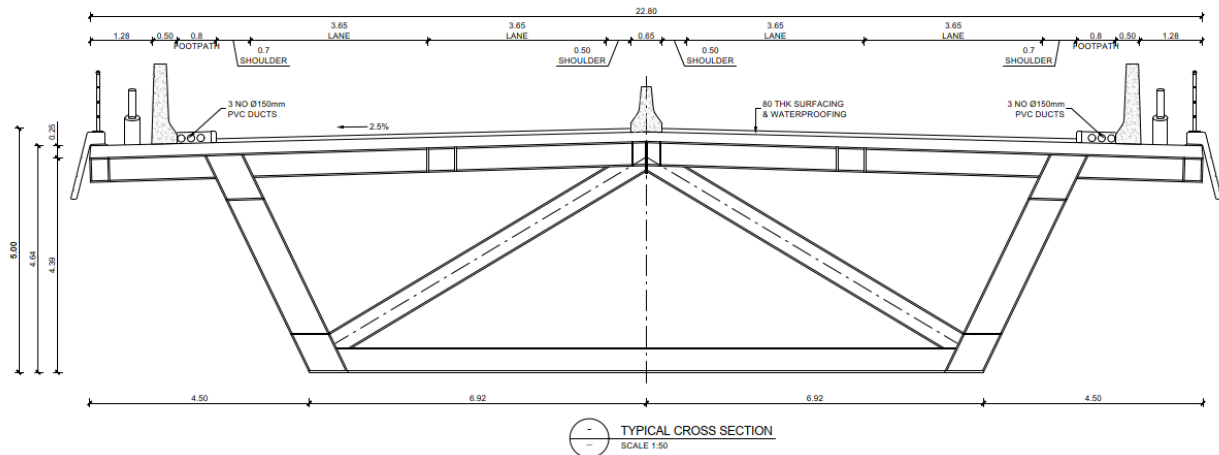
Typical cross section for cable stayed bridge (Main span) for Bhola-Lakshmipur.
